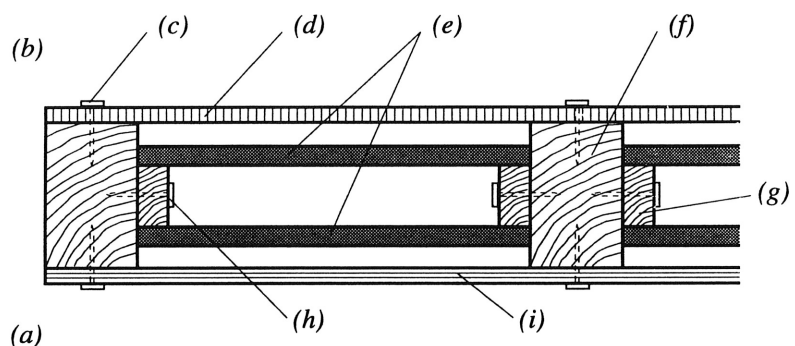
Non-load-bearing wall. (a) outside, (b) inside, (c) nails 2,1 x 40, (d) wood-based panel, (e) mineral fibre board, (f) sawn timber 60 by 97 mm, (g) sawn timber 25 by 46 mm, (h) nails 3,4 x 80, (i) wood panels with groove and tongue joints.
